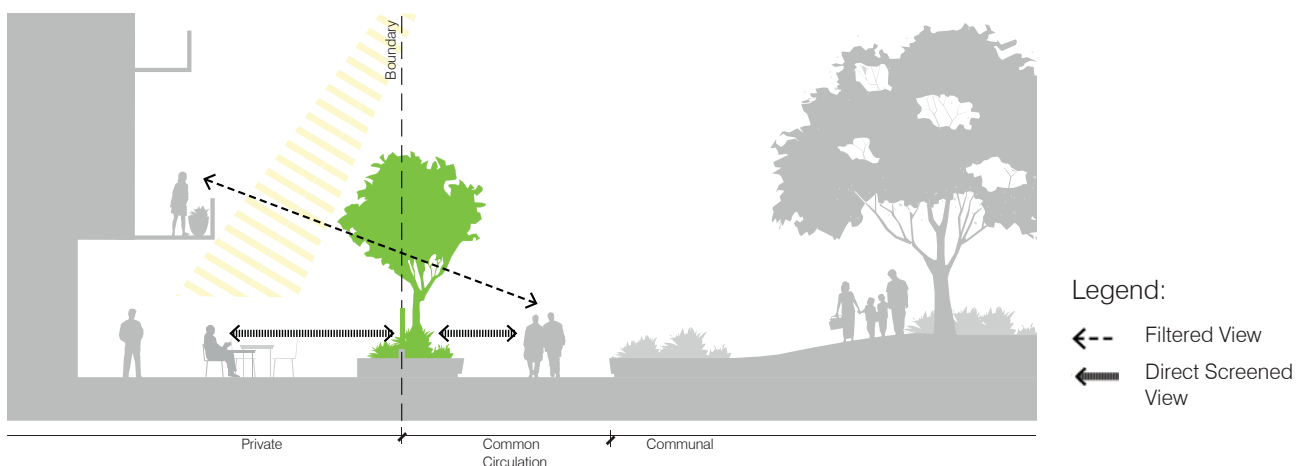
Fencing, raised planters and trees can help restrict and filter views between private and communal space
